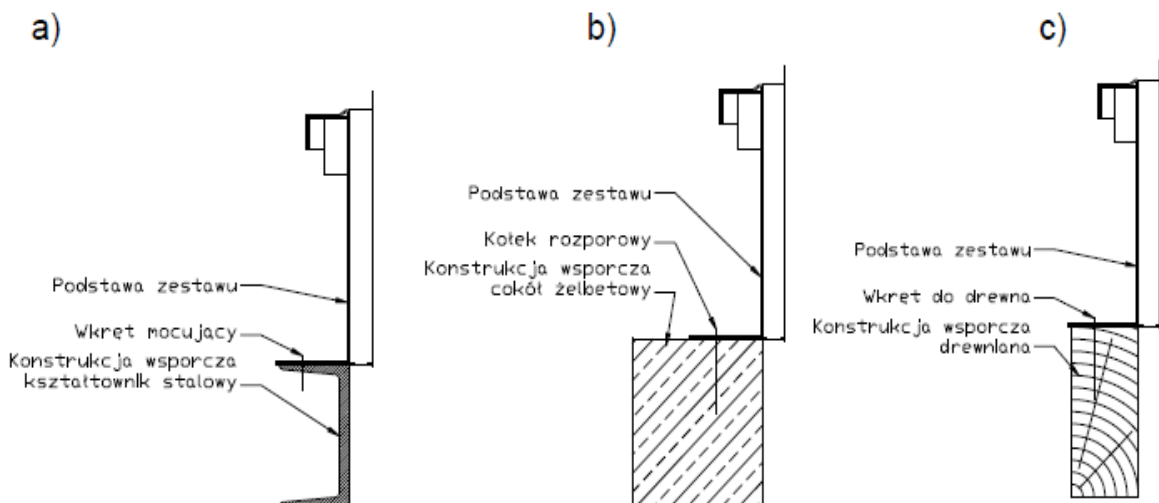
Fitting base of the set on: a) steel structure, b) reinforced concrete structure, c) wooden structure.
